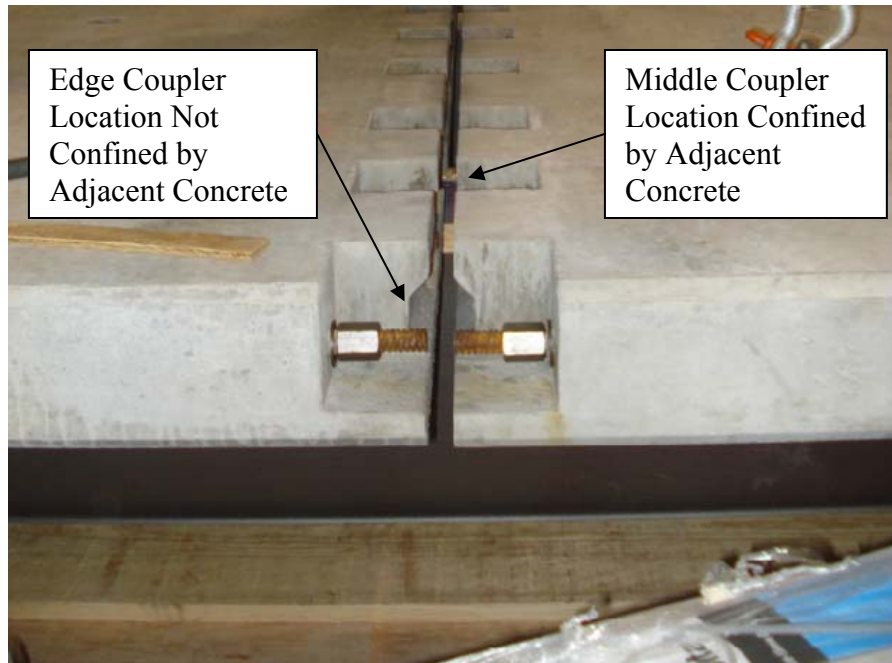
Transverse Joint Coupler Locations Before Grout Placement
